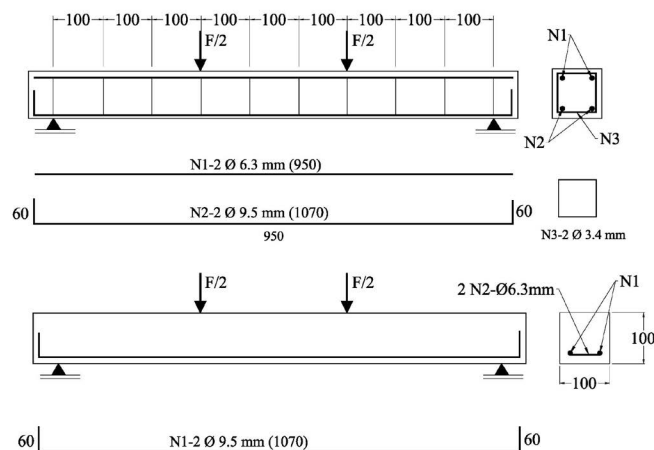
Geometry and reinforcement details of Furlan and Hanai [18] beam with stirrups (a) and without stirrups (b).
